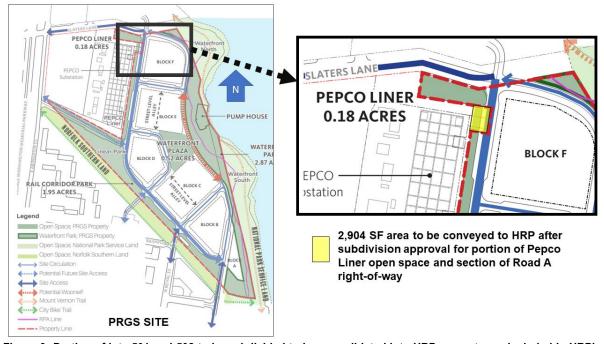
Portion of lots 501 and 502 to be subdivided to be consolidated into HRP property are included in HRP's plan for the PRGS site as sections of the Pepco Liner open space and Road A right-of-way.
